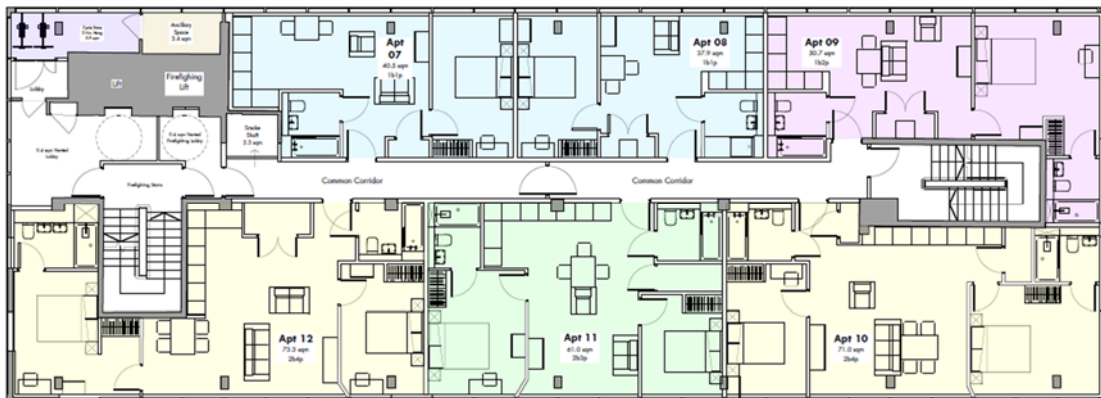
Proposed second floor plan: Studio RBA (June 2024)
